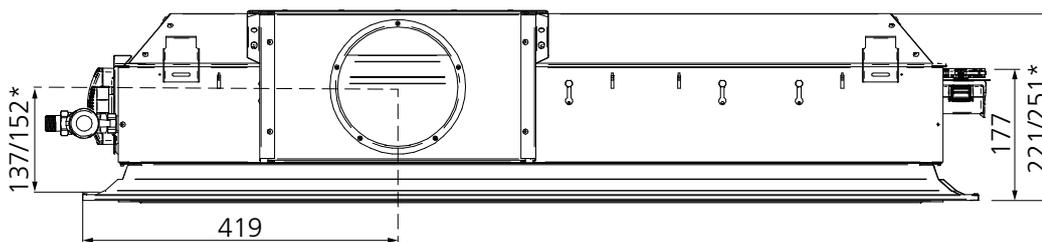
Dimensional drawing, side view. Air connection on the long side - pos 2.
